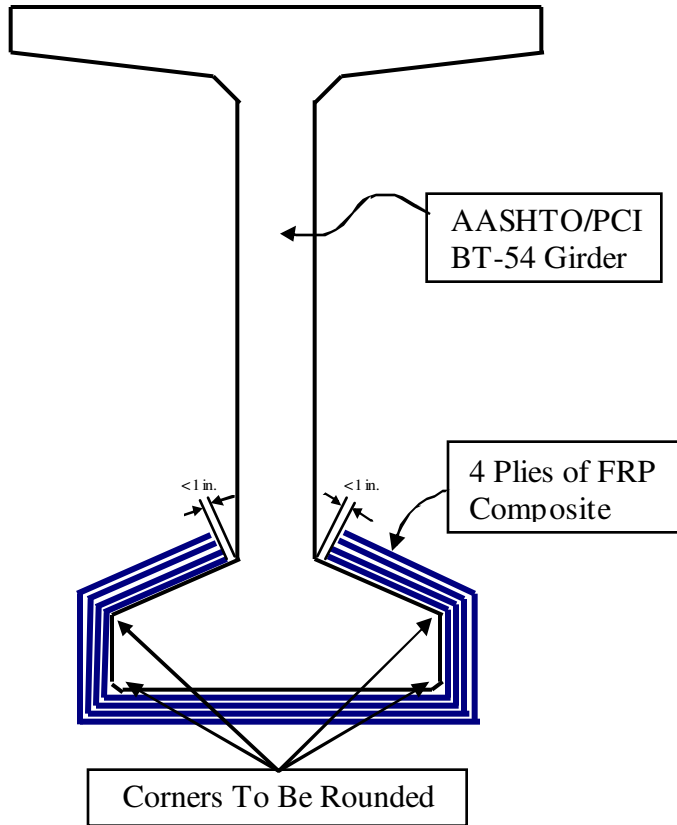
Elevation drawing of proposed FRP Repair (Swenson 2003a)
